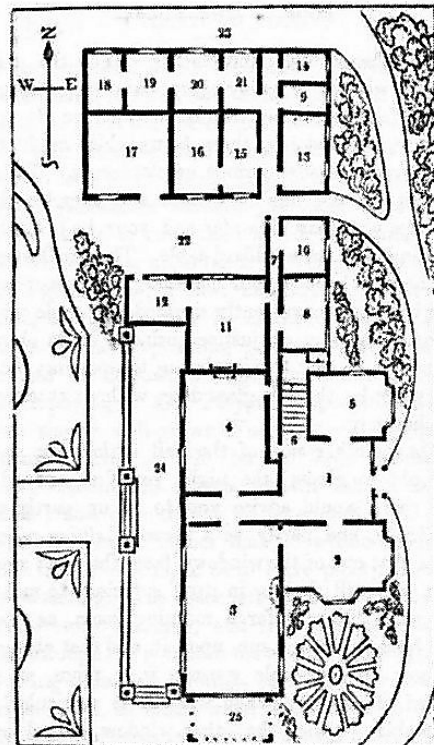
Ground Plan.—1, Hall. 2, Morning room and library. 3, Drawing room. 4, Dining room. 5, Gentleman's business room. 6, Staircase. 7, Passage to office. 8, Housekeeper's room and store closet. 9, Dressing room for men-servants. 10, Butler's pantry. 11, Kitchen. 12, Scullery. 13, Servants' hall. 14, Room for female servants. 15, Dry larder or pantry. 16, Wet larder and salting room. 17, Laundry. 18, Cheese room. 19, Butter room. 20, Churning room. 21, Dairy. 22, Kitchen court. 23, Road to stable. 24, Terrace. 25, Conservatory.
